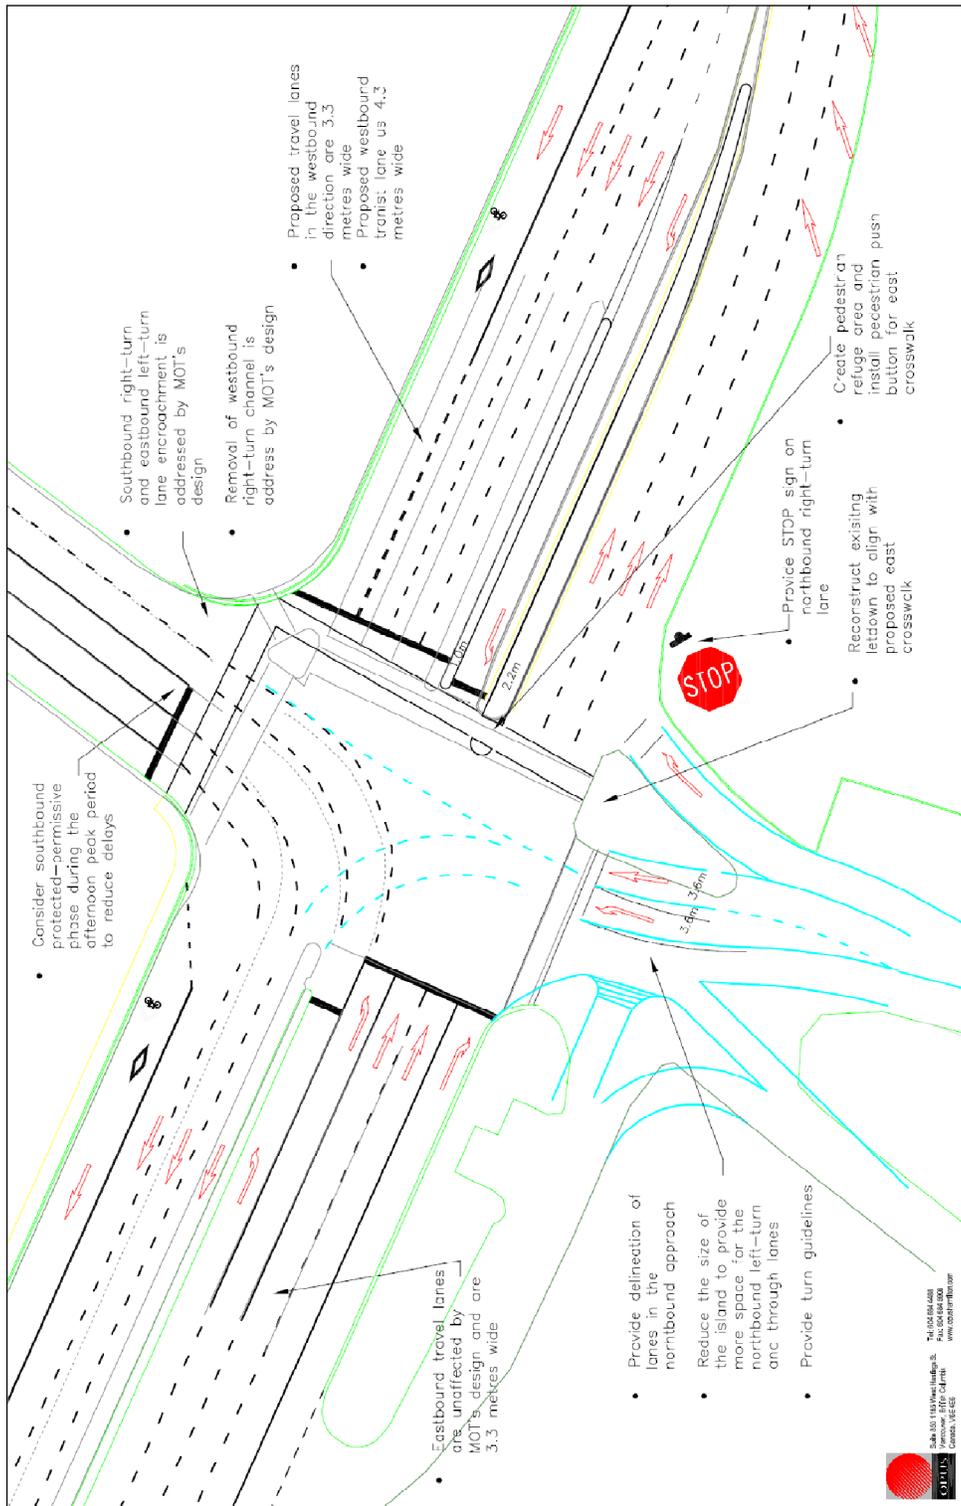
CONCEPT PLAN FOR THE MARINE DRIVE AND CAPILANO ROAD INTERSECTION
